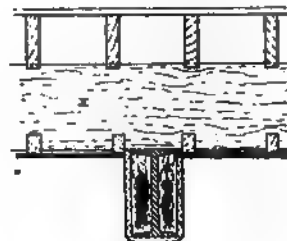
A Framed Floor with Girder projecting below the Ceiling, and boxed in with Wood.
